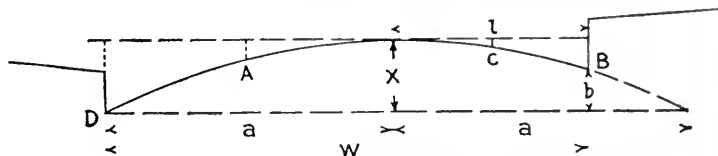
CROSS-SECTION OF PAVEMENT: ONE GUTTER HIGHER THAN THE OTHER.
